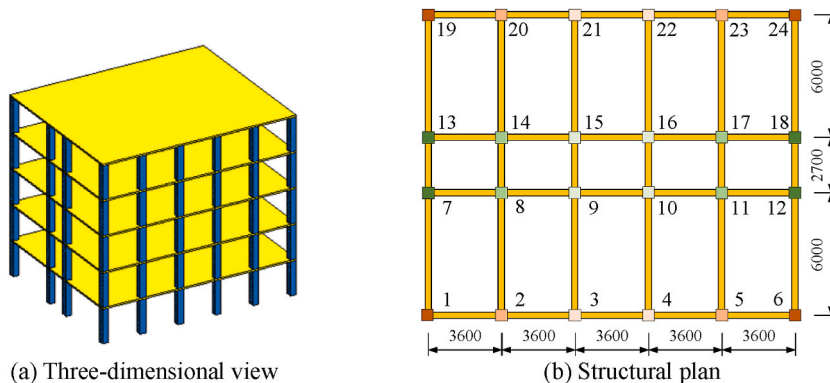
Three-dimensional and structural plan of the 5-story RC structure.
